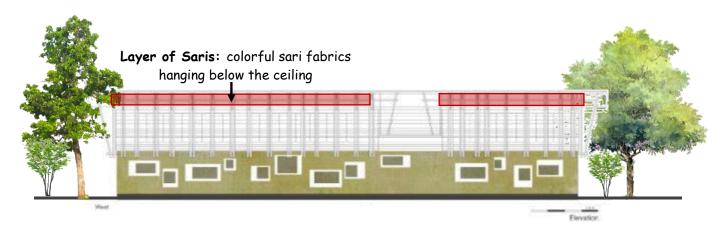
West Elevation of the Building (ArchDaily, 2010)
